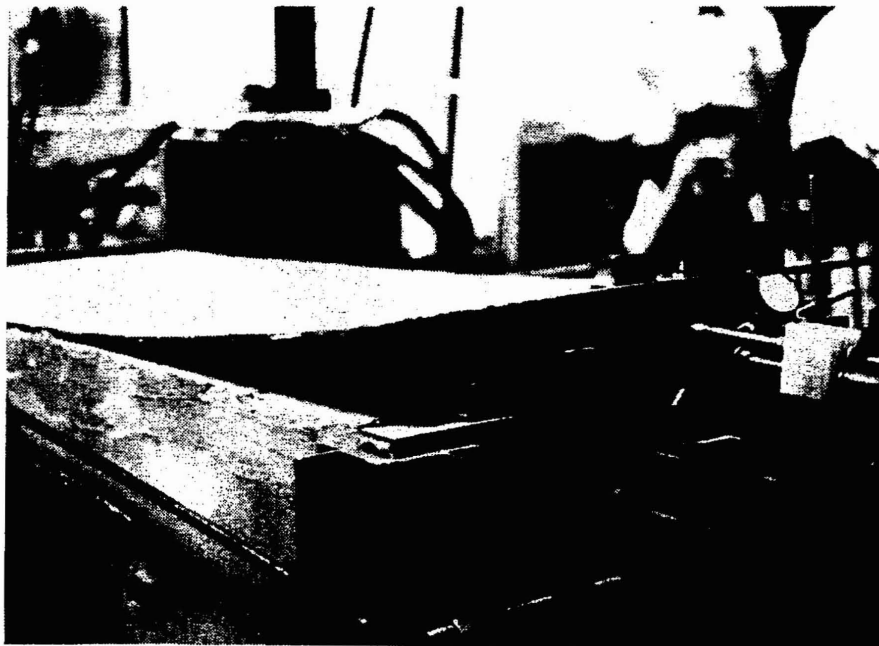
Specimen T-1. Plate Deformation During Final Stages of Testing
